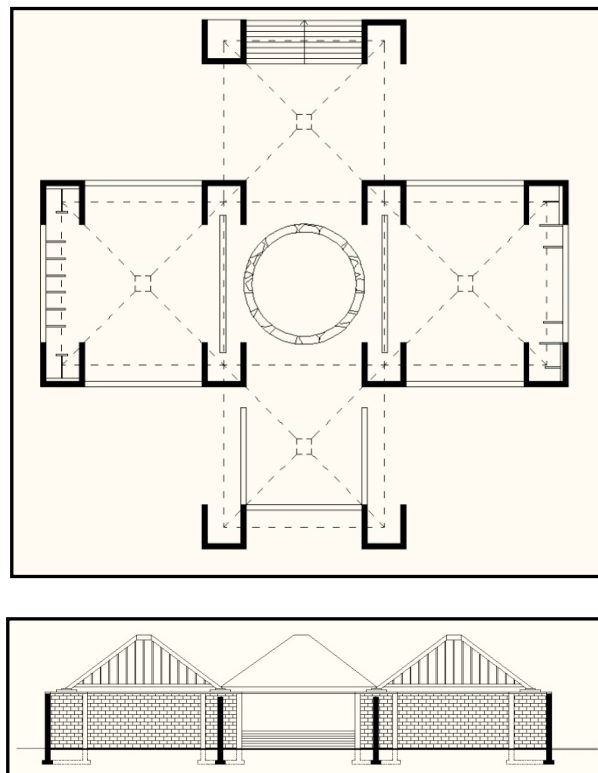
The Bathhouse Ground floor plan and Section (Re-drawn by Author)
